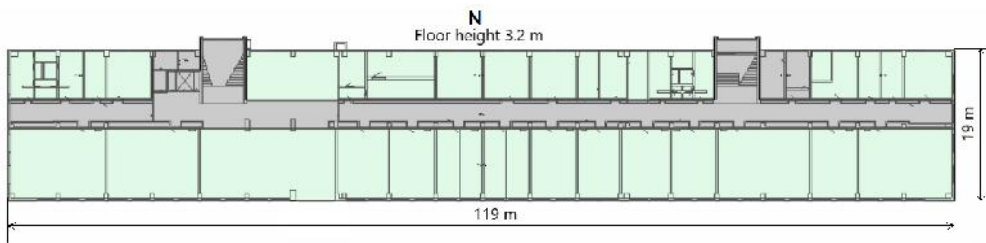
Zoning of a building, using a typical floor as an example (N – North).
